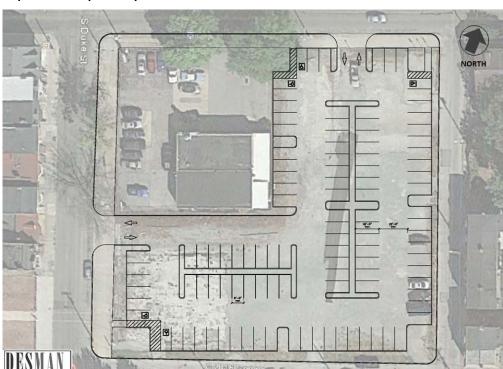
Proposed Conceptual Improvement Plan for GA Lot #11
